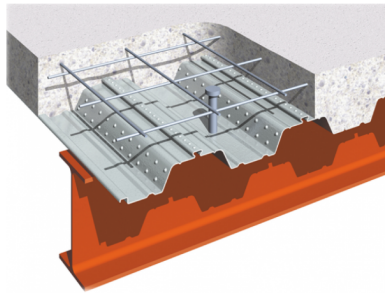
New composite floor system ComFlor from Steel & Tube
